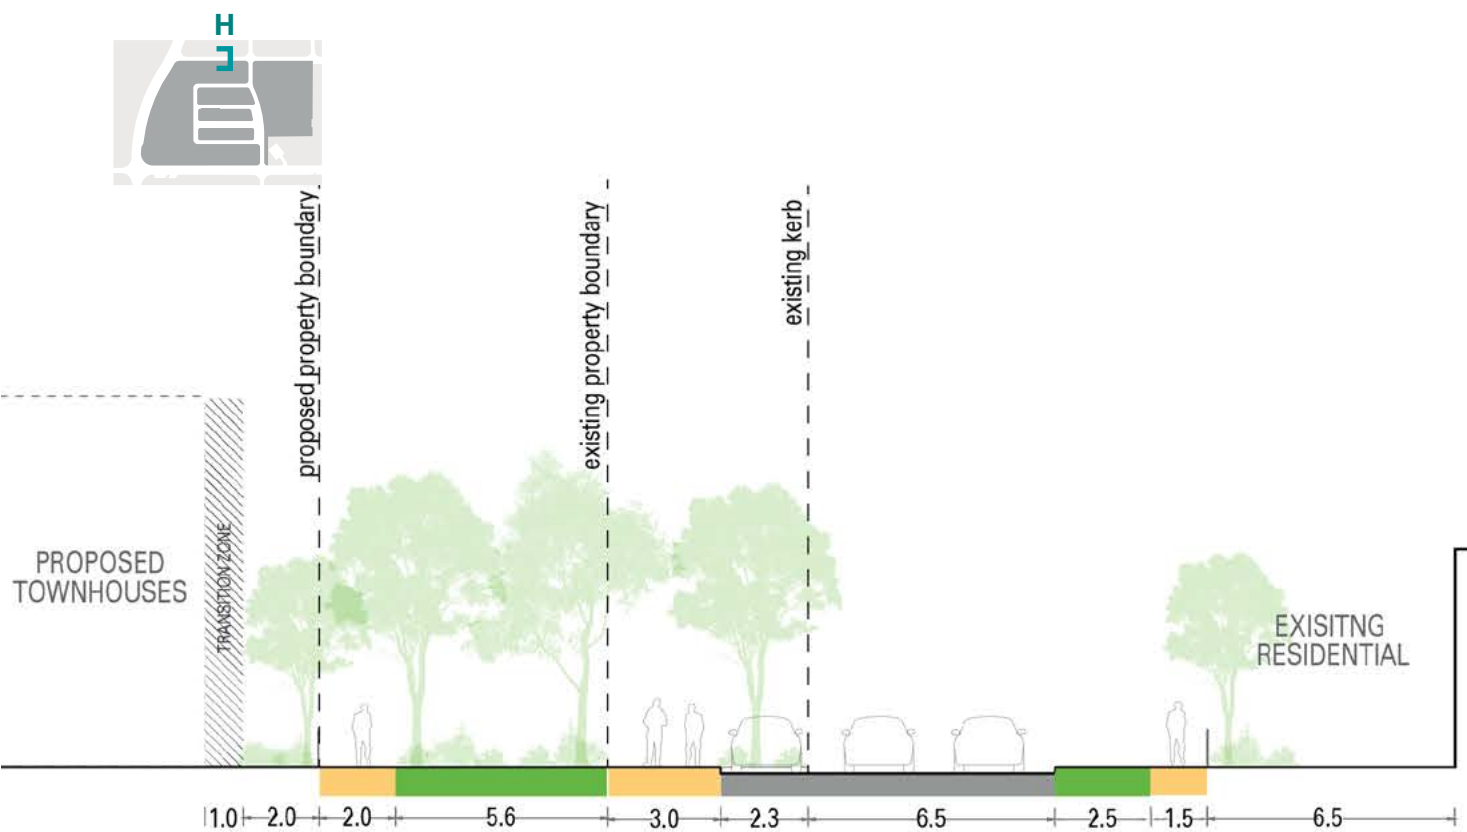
Section H: Perkins Avenue (1:200@A3)
